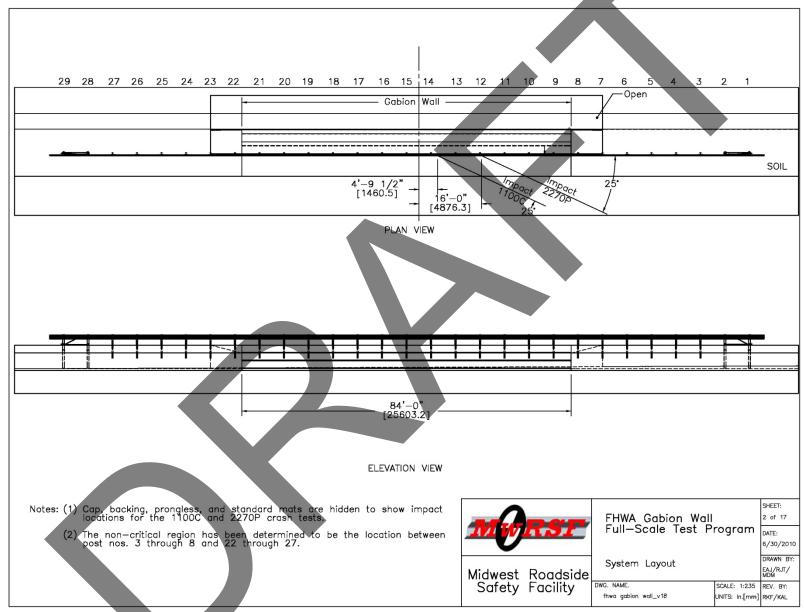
Schematic. System Layout Details, Test Nos. MGSGW-1 and MGSGW-2.
